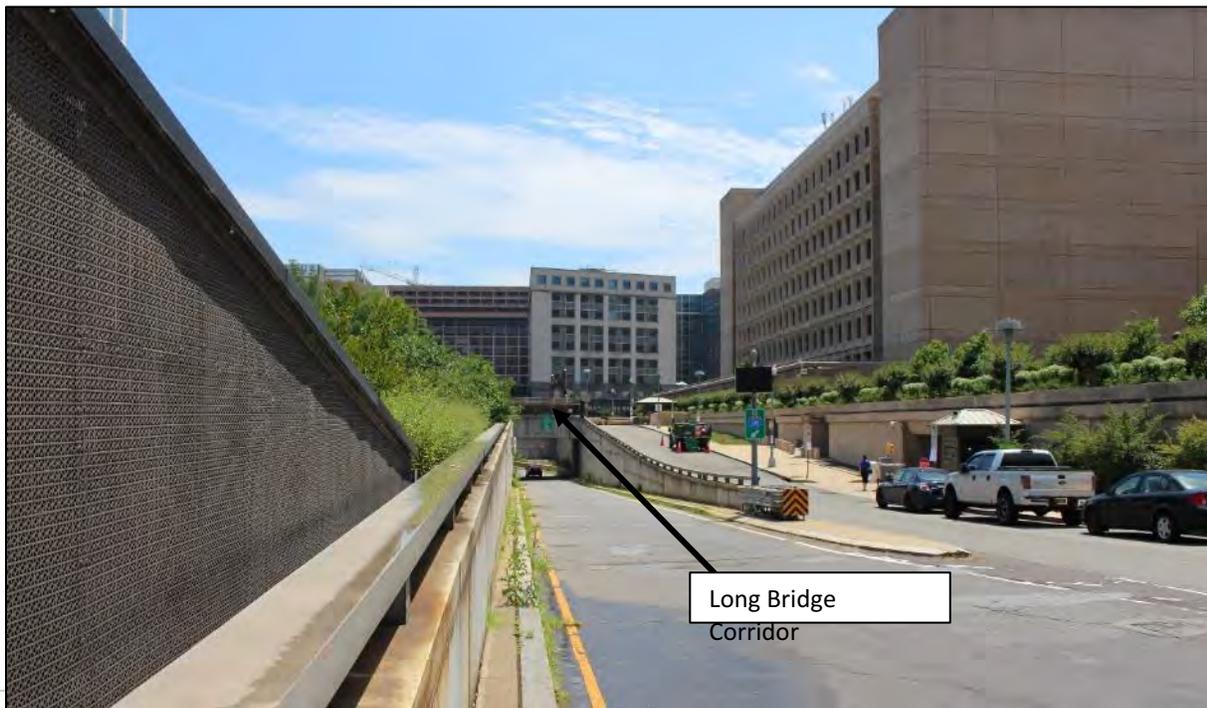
| Photograph location 19. Long Bridge Corridor from intersection of Maryland Avenue SW, and 7th Street SW, facing southwest
